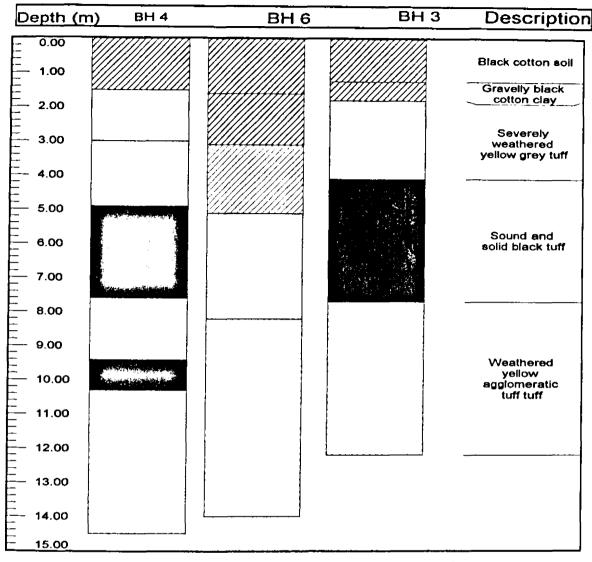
Subsurface profiles at TPS Serena Hotel
